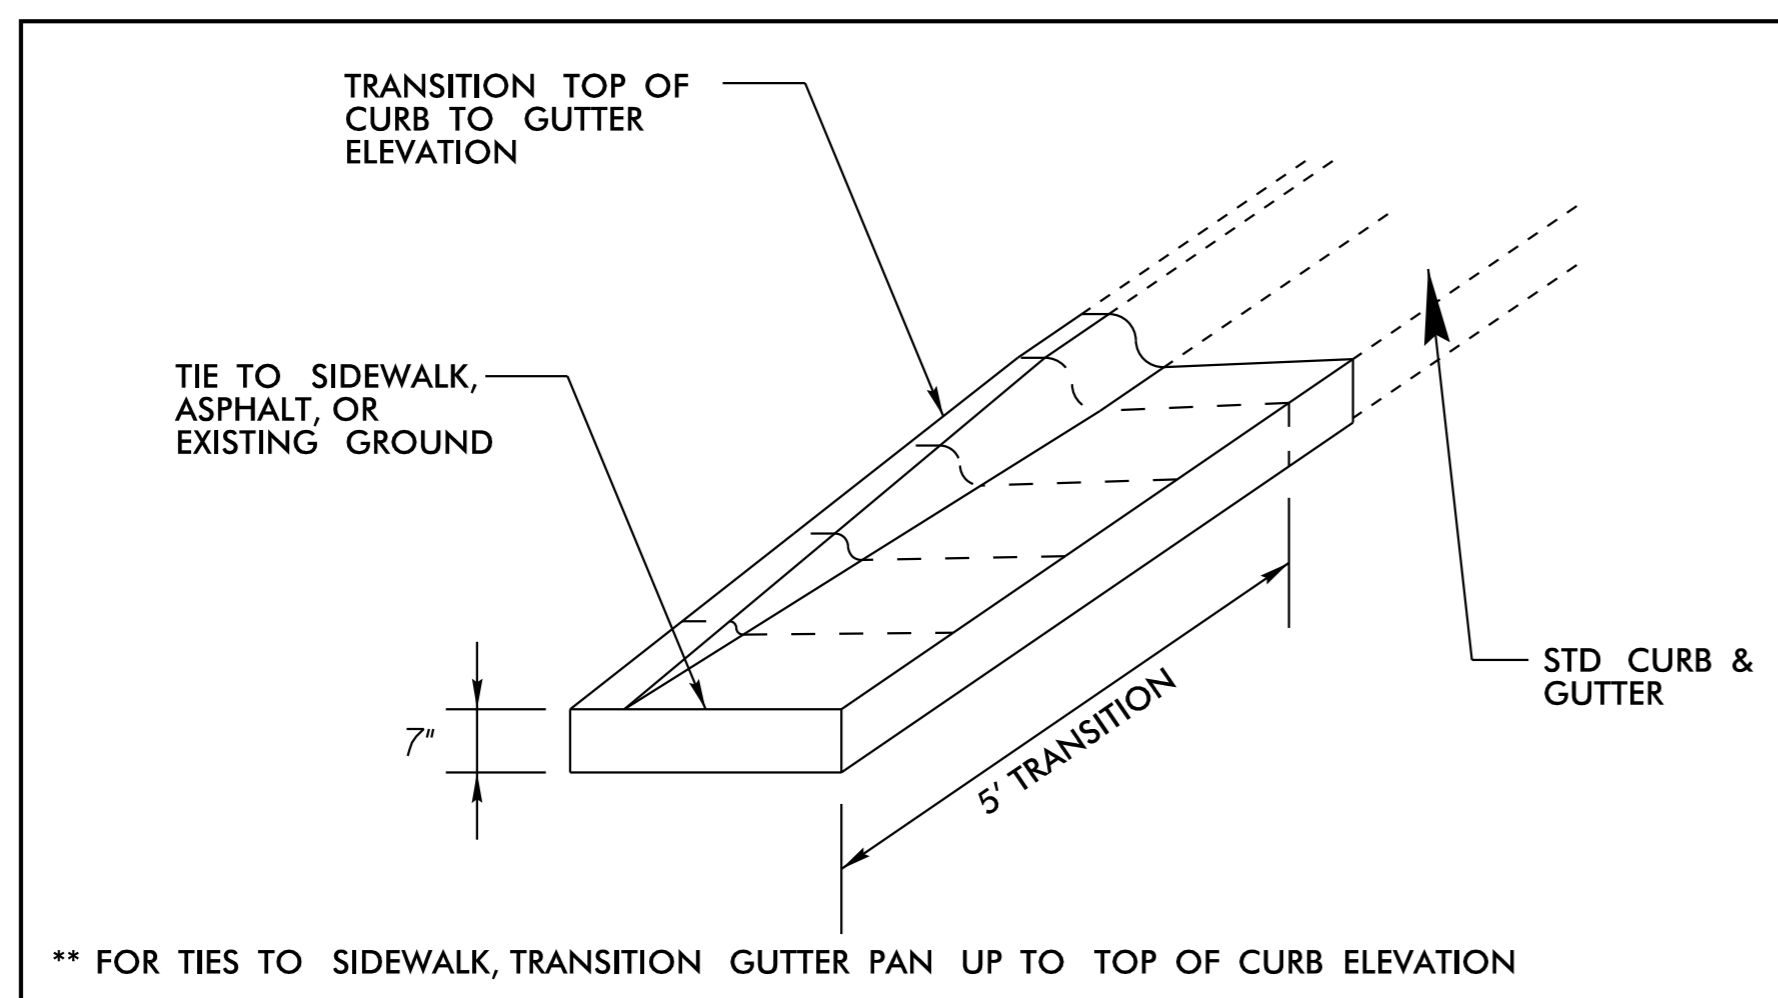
TYPICAL DRIVEWAY TURNOUT
